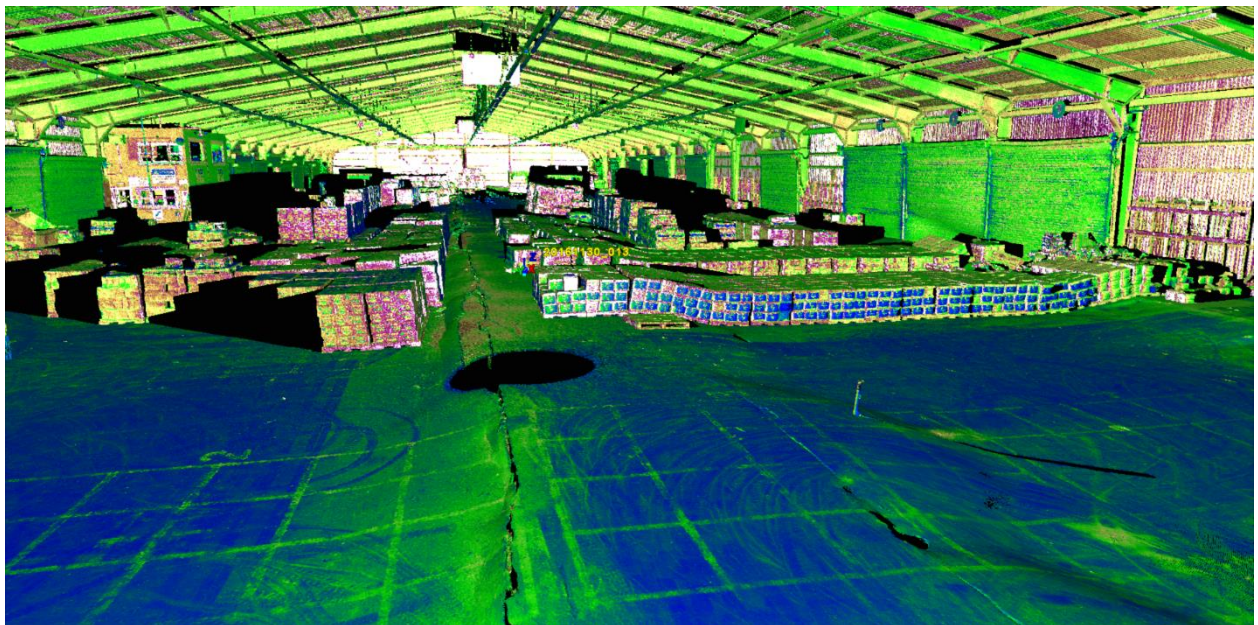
LiDAR scan obtained inside Building S37 showing cracking and settlement of the pavement around the buried precast concrete seawall (up to 550 mm of differential settlement occurred).
